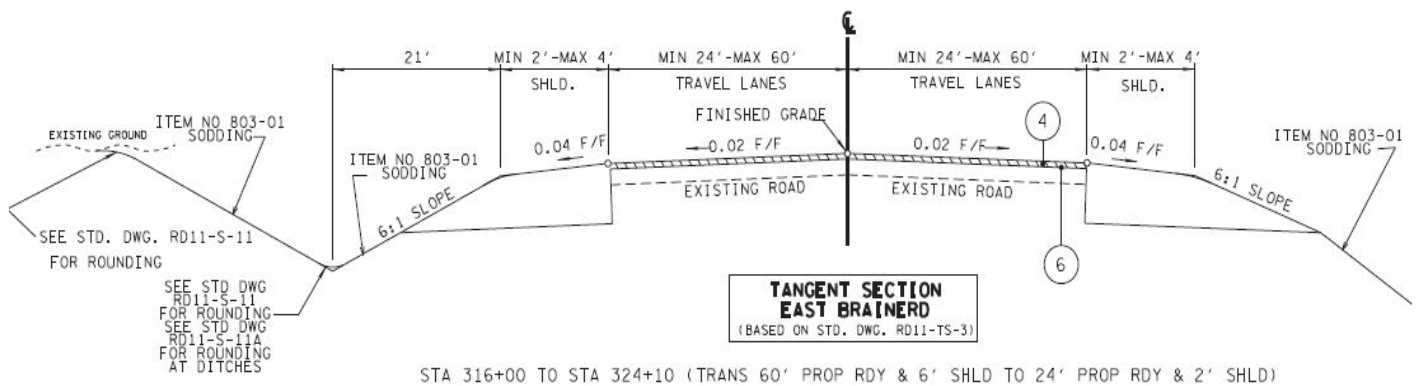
Typical Section of SR-320 east of the intersection with SR-321 to the end of the project limits (05/12/2020 ROW Field Review Plans, Sheet 2B1)
